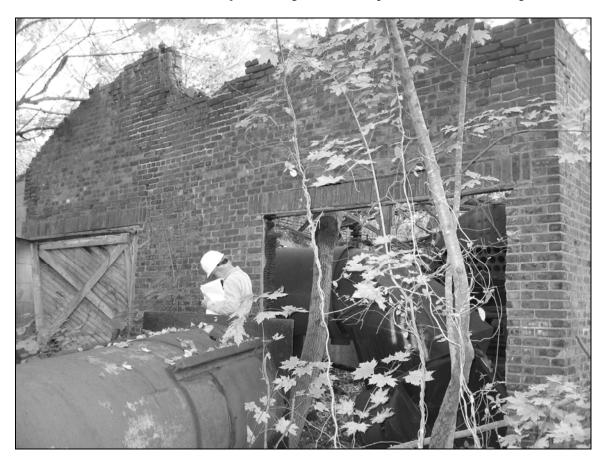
Main section of northern façade, facing south. Collapsed smokestack in foreground.
